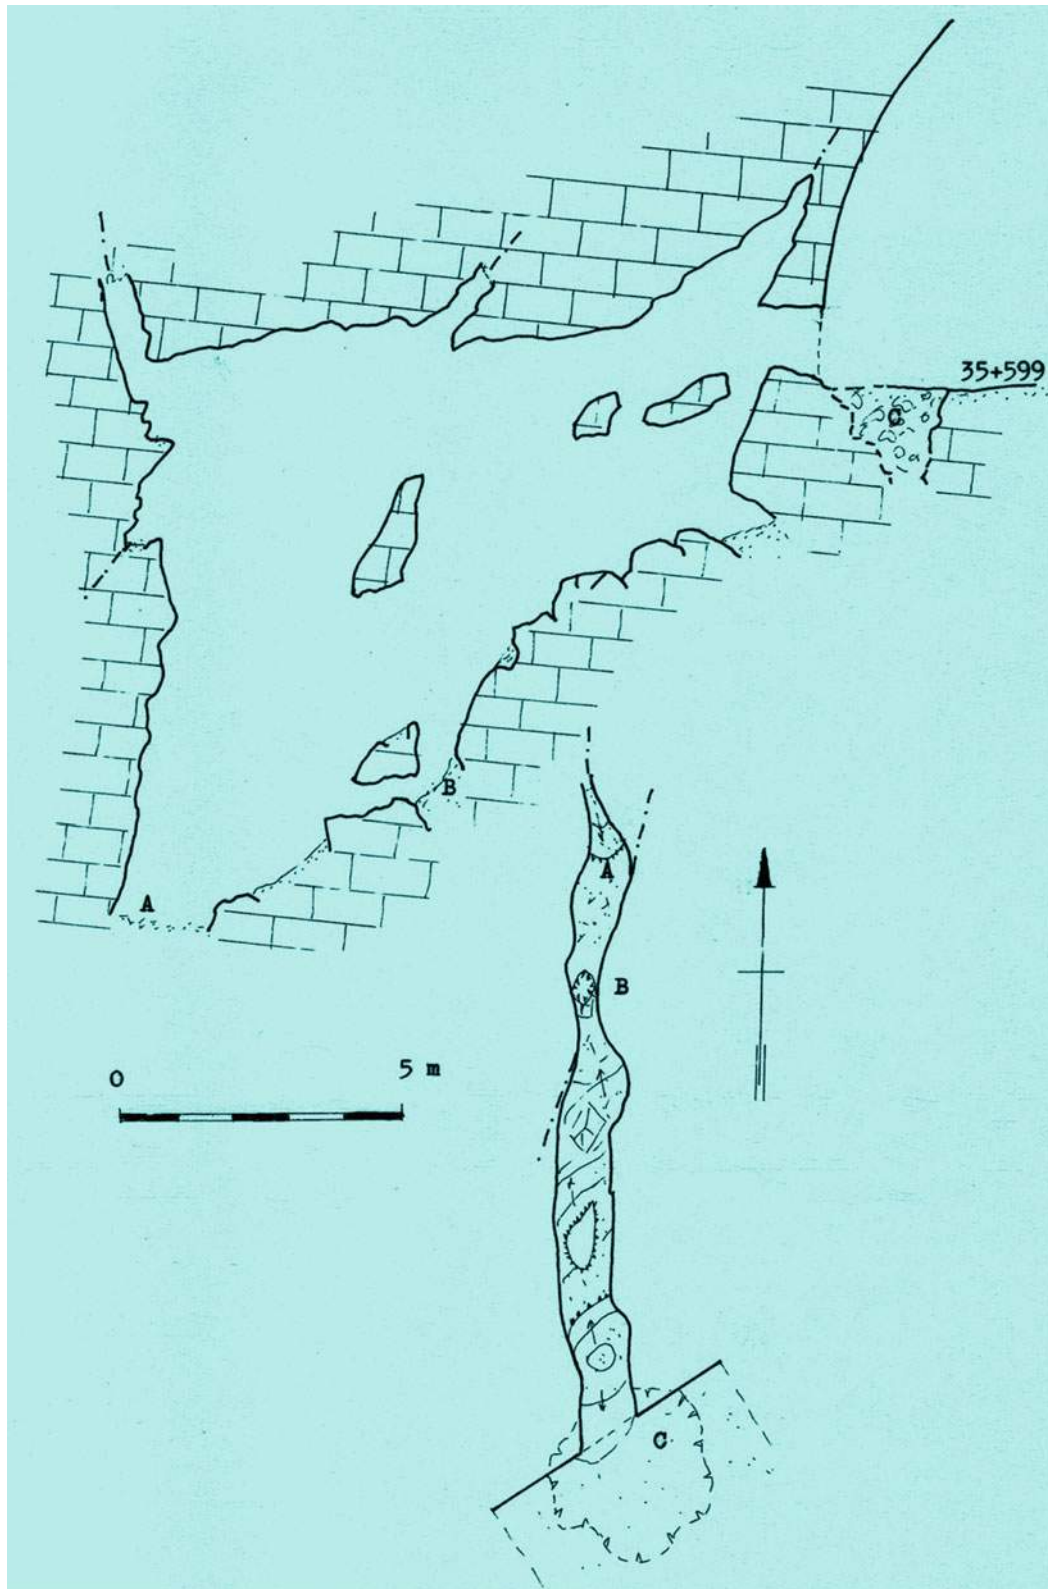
Profile and plan of cavern at km 35 + 599 in Sleme Tunnel
